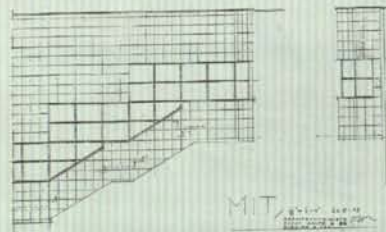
North facade study (A.A. Archive - 5/22/48)
